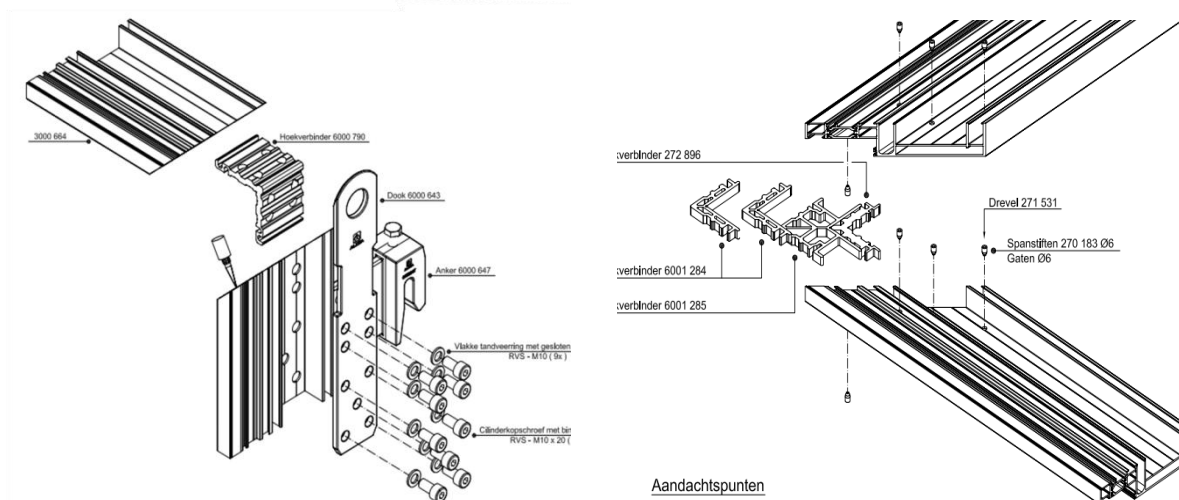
Alcoa AA9562 system presents complex corner details; Multiple assemblies are bonded with glue or tightened with bolts which require a custom tool to disassemble them.
